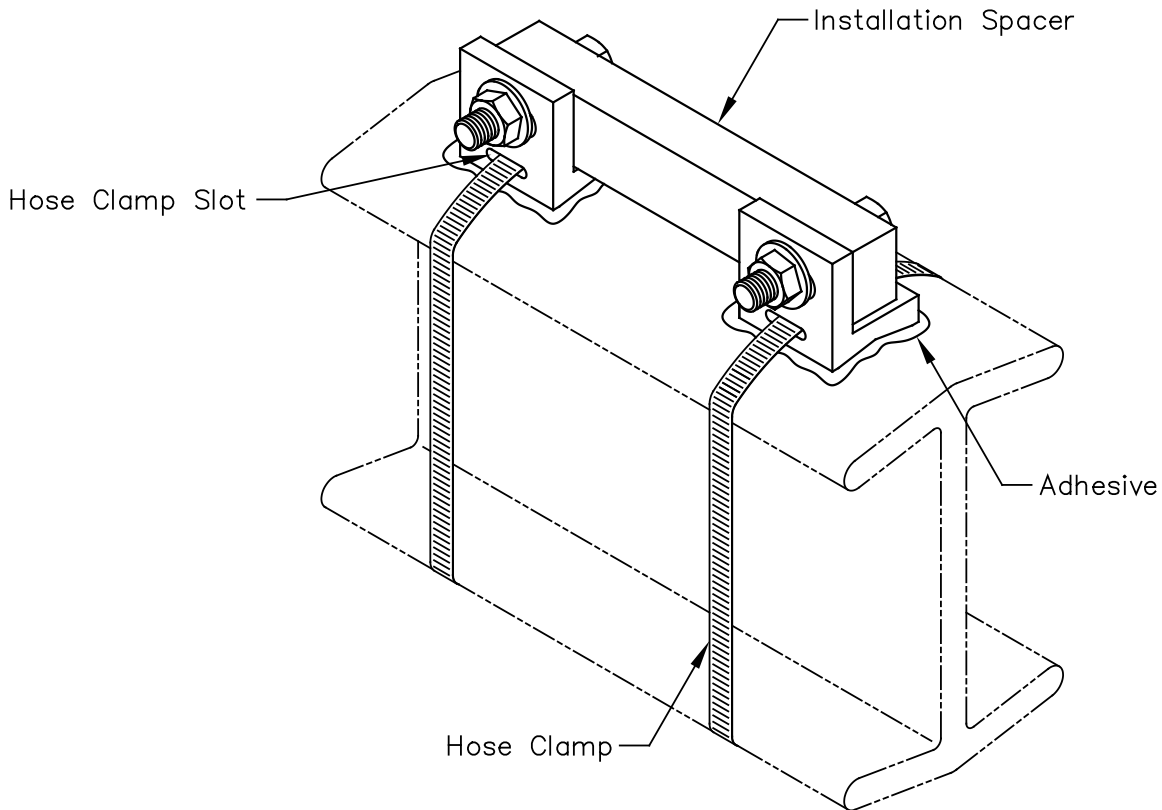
C – Bonded Transducer Mounting Bracket / Installation Spacer
